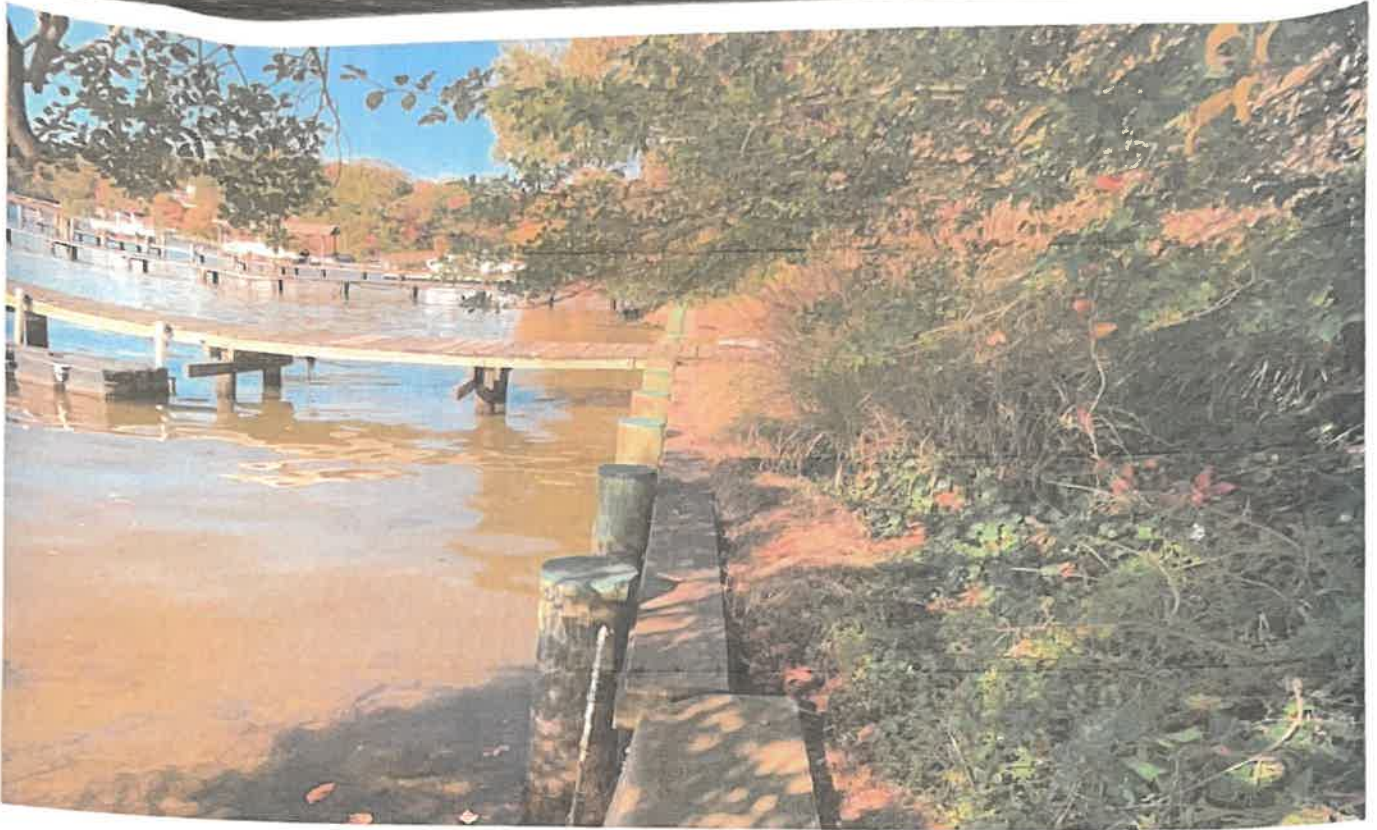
Looking North Towards Adjacent Property Bulkhead, Area Stable
